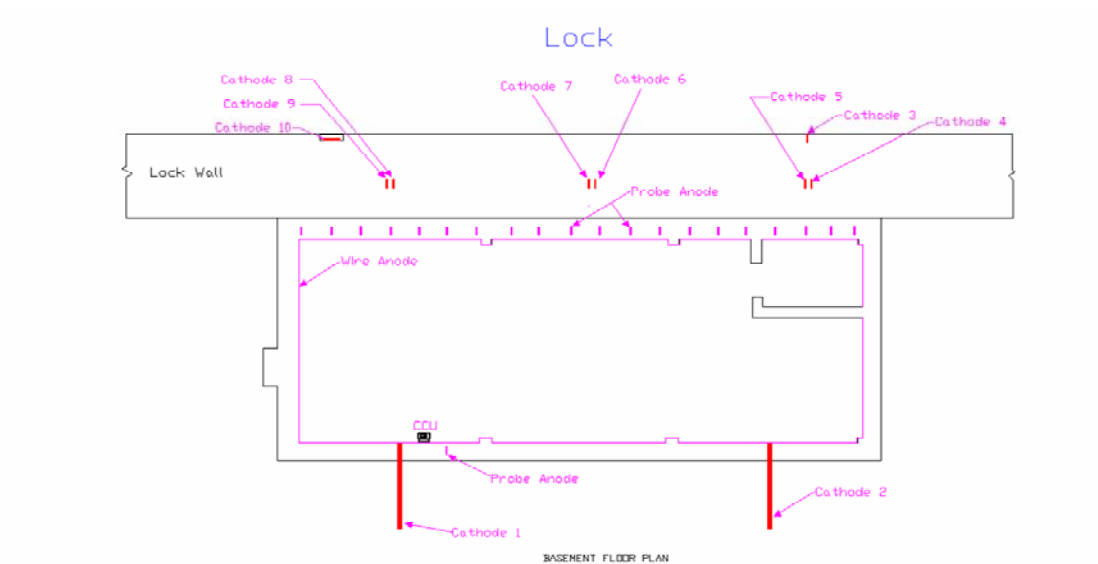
EOP Installation layout in basement of old lock house, Lock and Dam 7.
